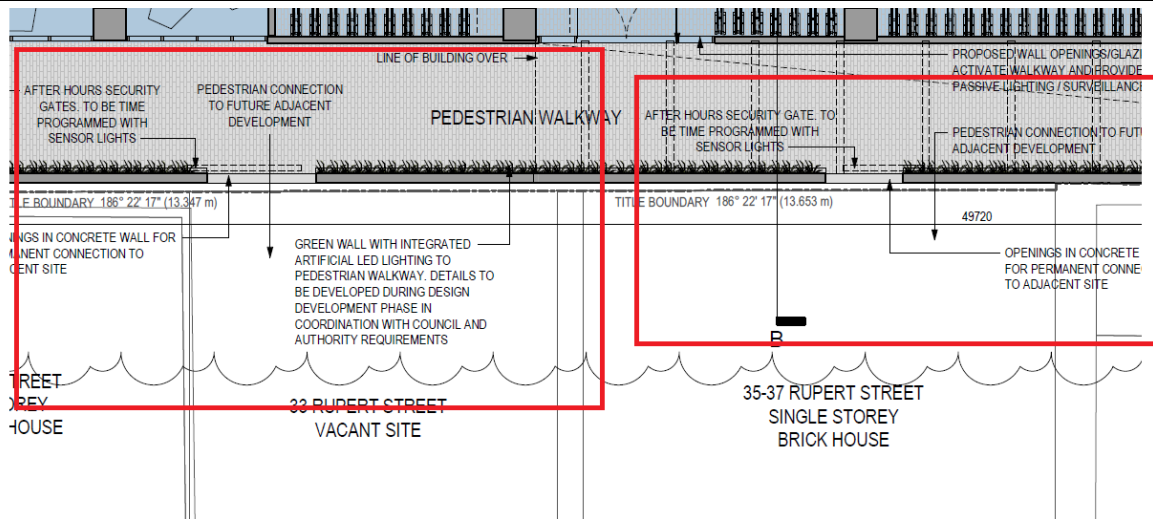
Openings and security gates of development at No 40-50 Rokeby Street (extracted from the ground floor plan forming part of the plans supported by PDC on 18 November 2020)
